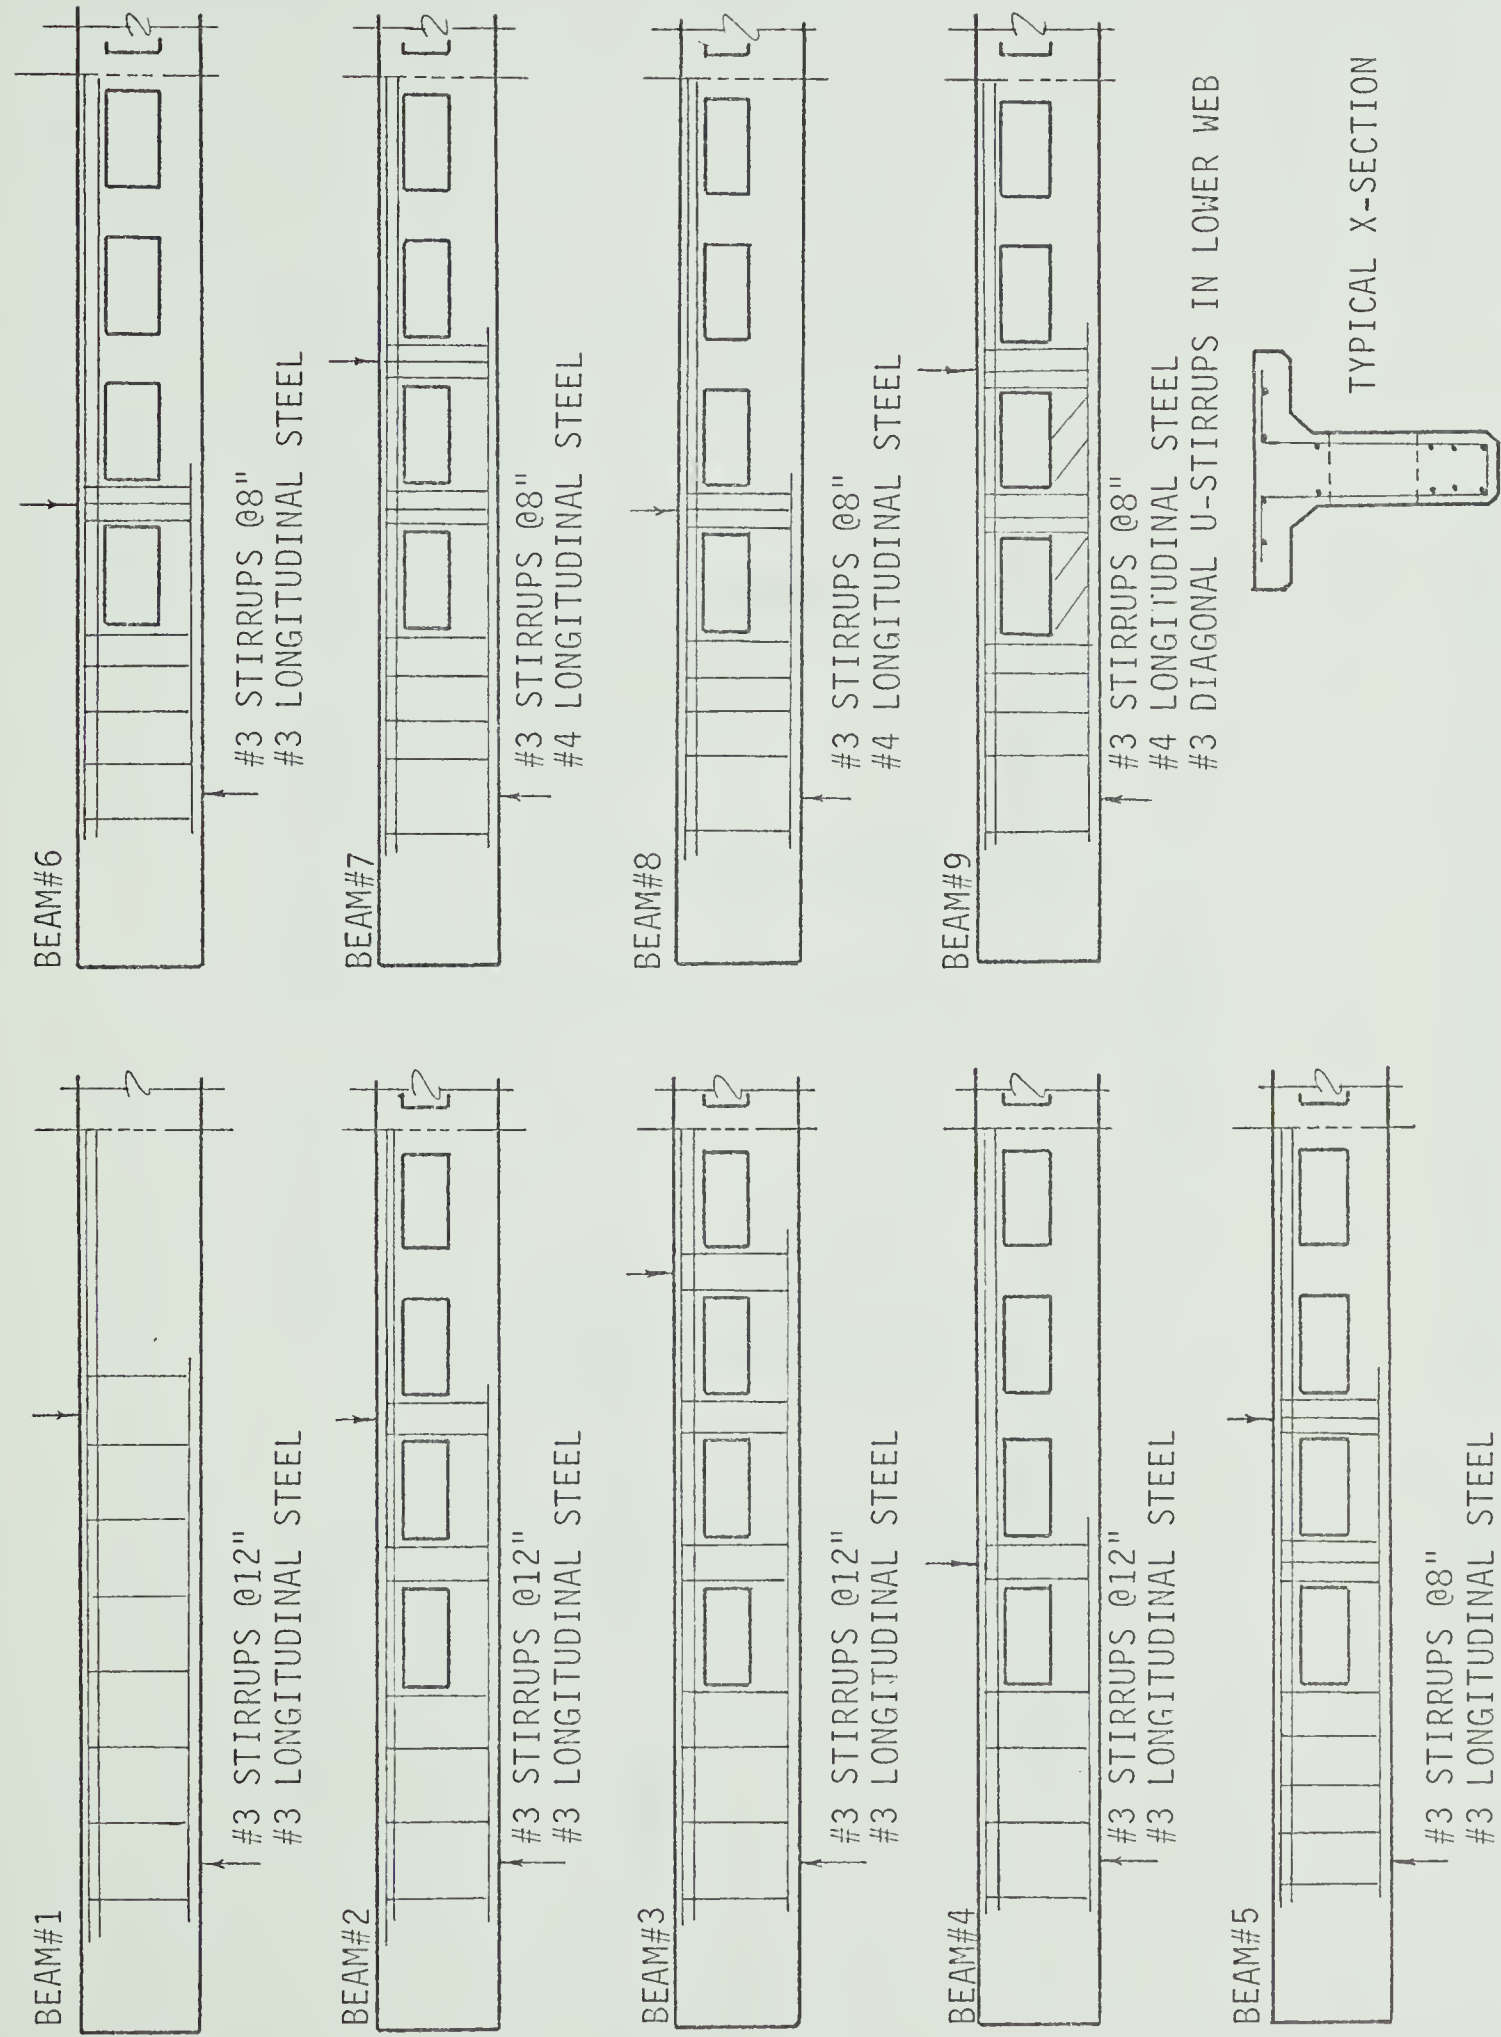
TEST BEAMS AND REINFORCEMENT DETAILS
